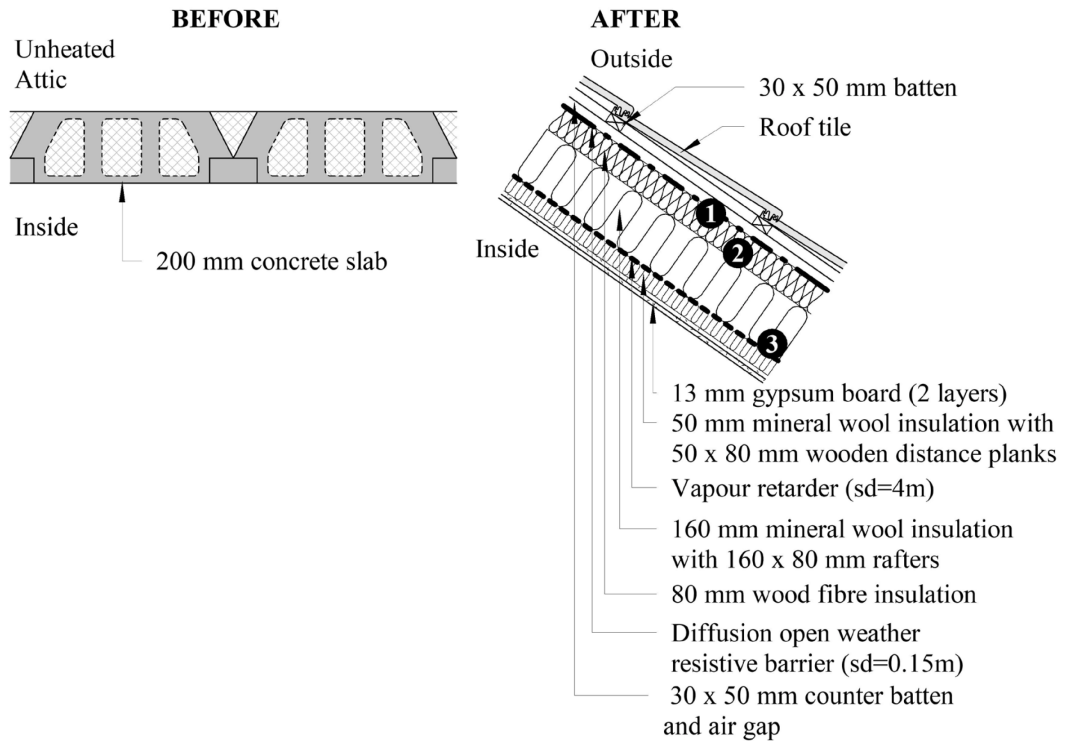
Cross-section view, roof construction, initial and retrofitted state.
